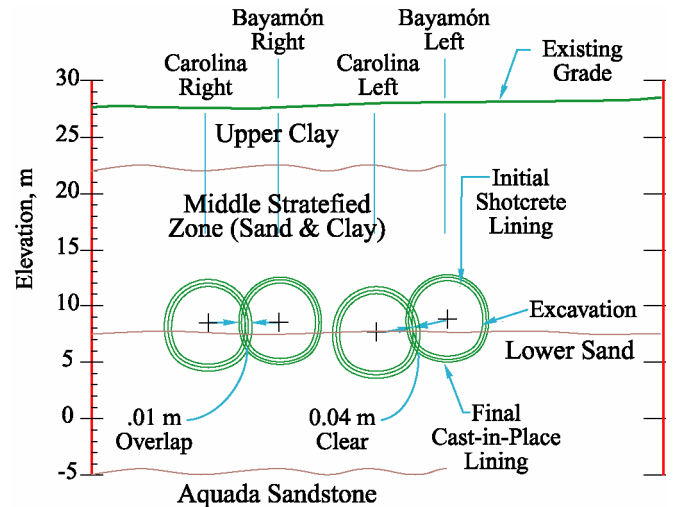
Tunnel Configuration at Turn-Under, Sta 219+10
